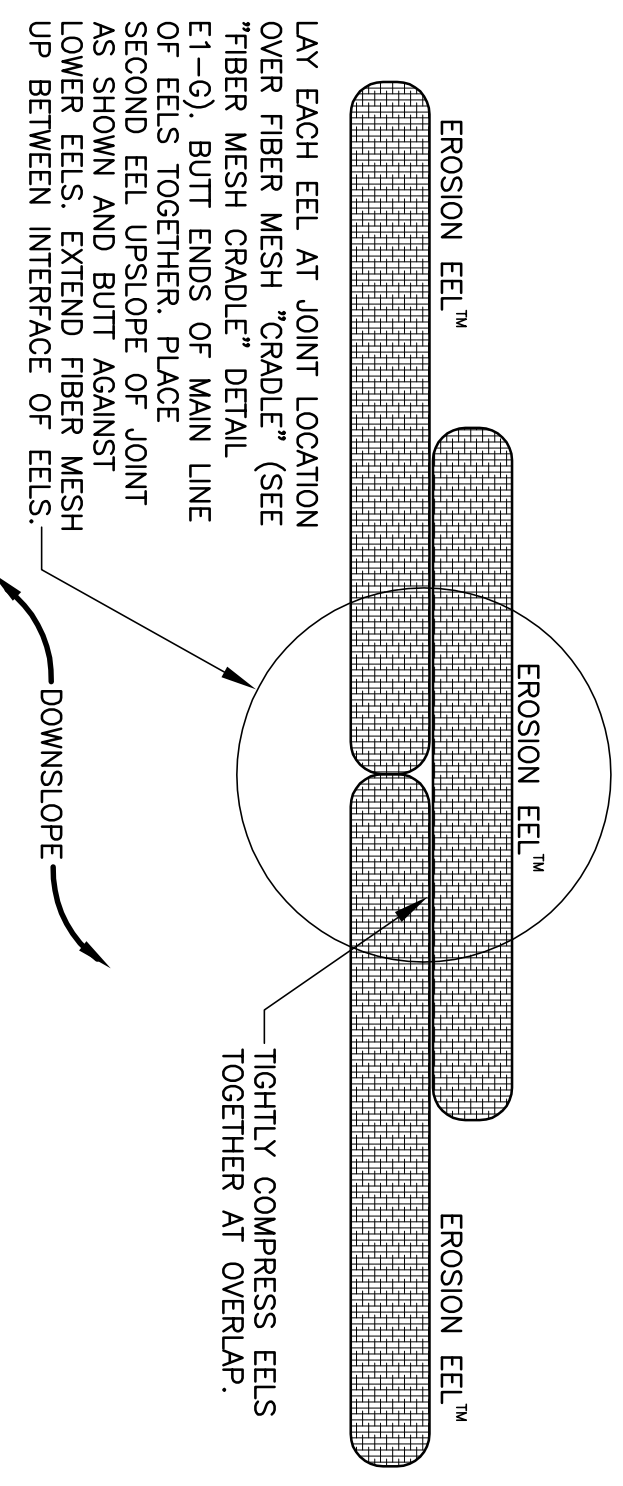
C: INTERCEPTING SHEET FLOW PERPENDICULAR TO FLOW PATH - PLAN VIEW
